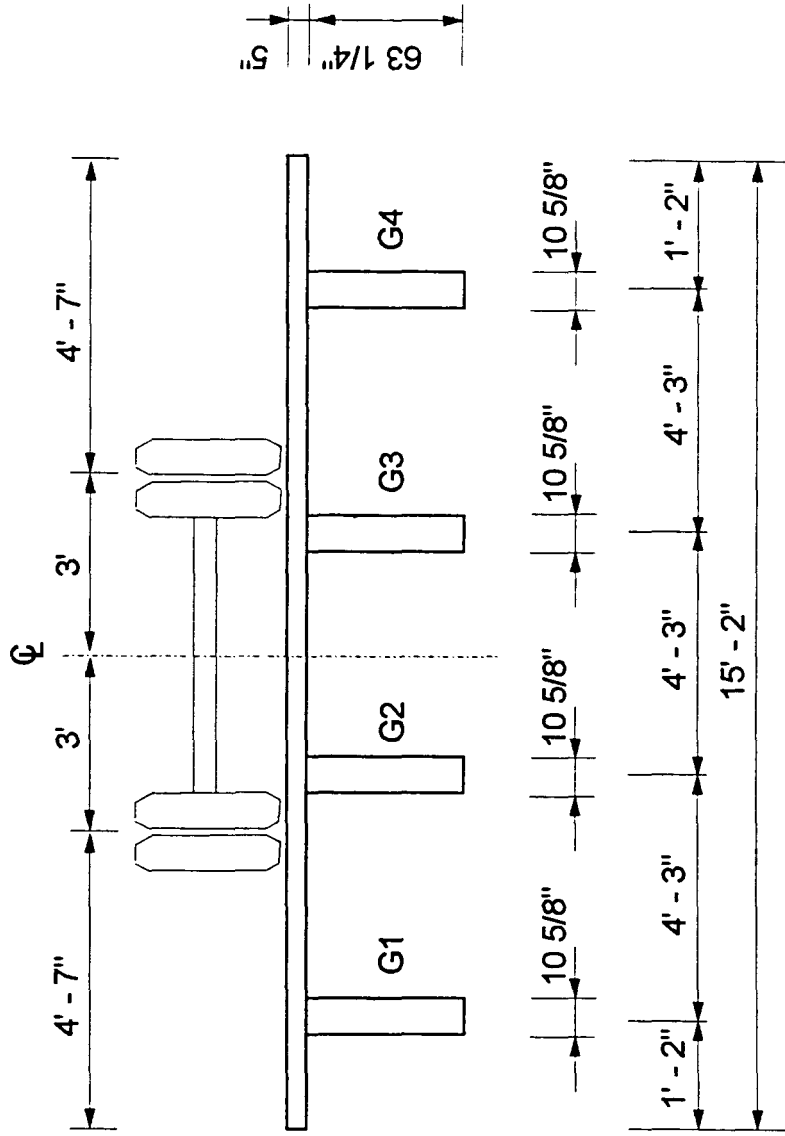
Cross section dimensions and transverse position of the vehicle on Span 3 of Wittson Bridge
